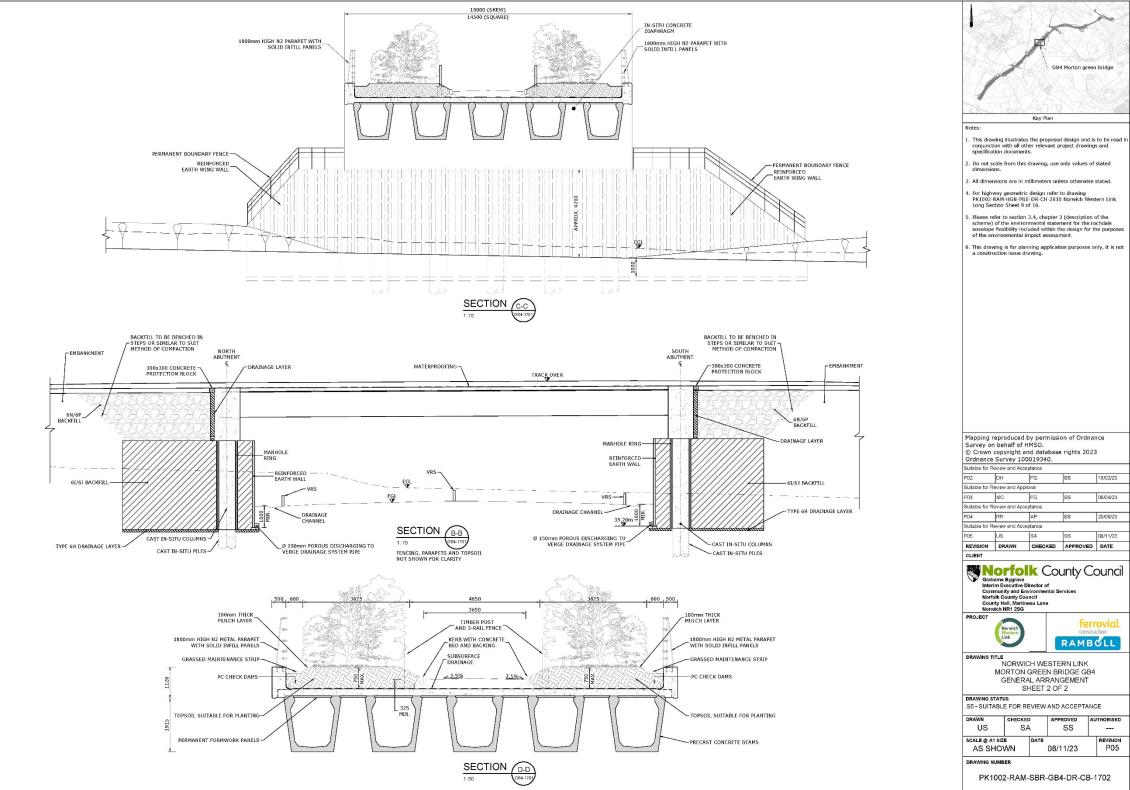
The General Arrangement Drawings for The Morton Green Bridge GB4, illustrating the structural cross section of the green bridge
